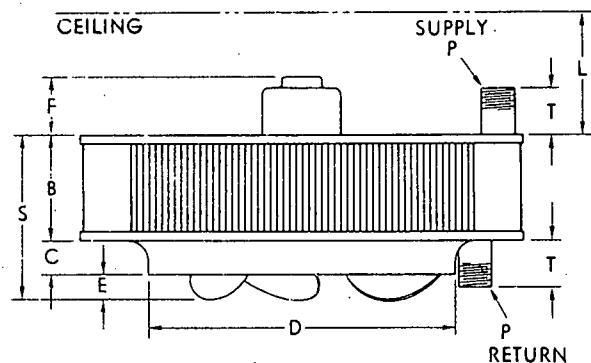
Dimensions, Model P Unit Heater, Sizes 102-720
